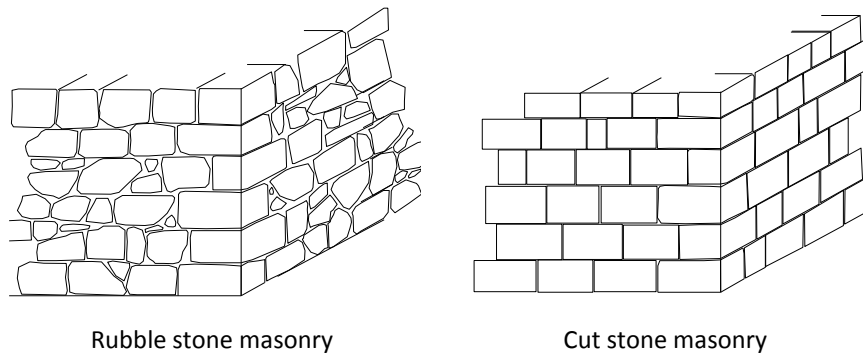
Stone masonry construction with rubble and cut stone (By the author)
